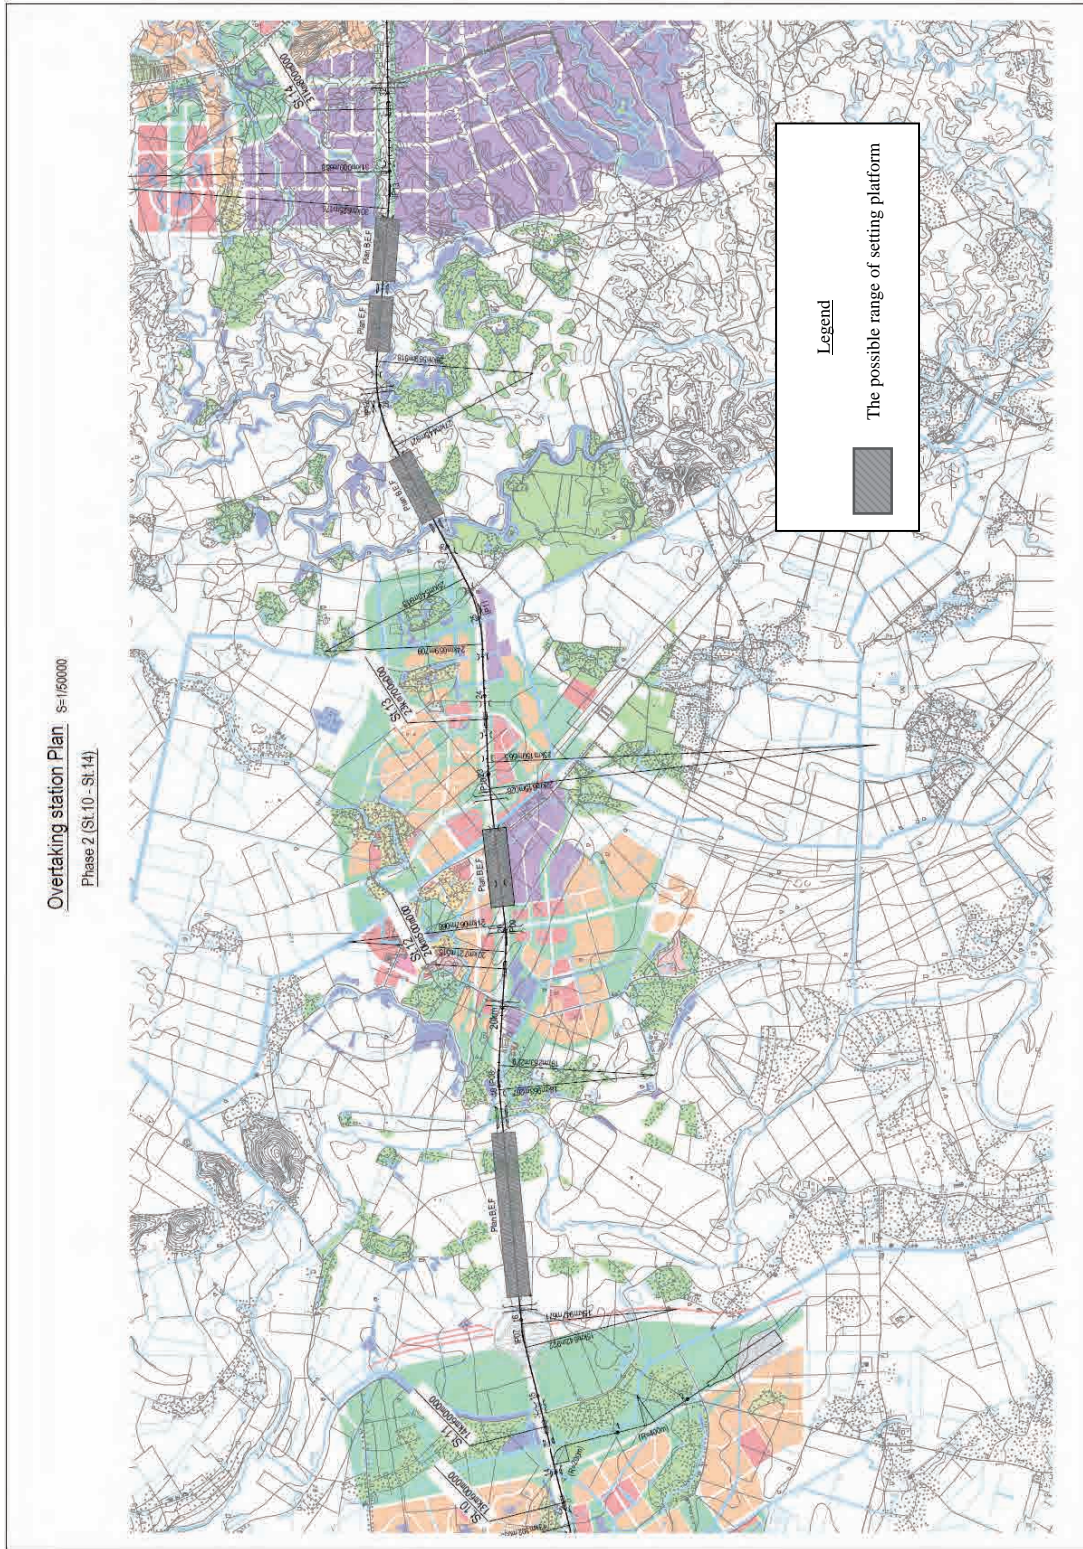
The area where overtaking stations can be constructed Source: JICA Study Team
